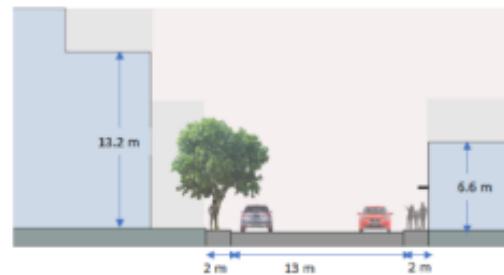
Site Section View of the Majhedriya to Mahitwaar Road
